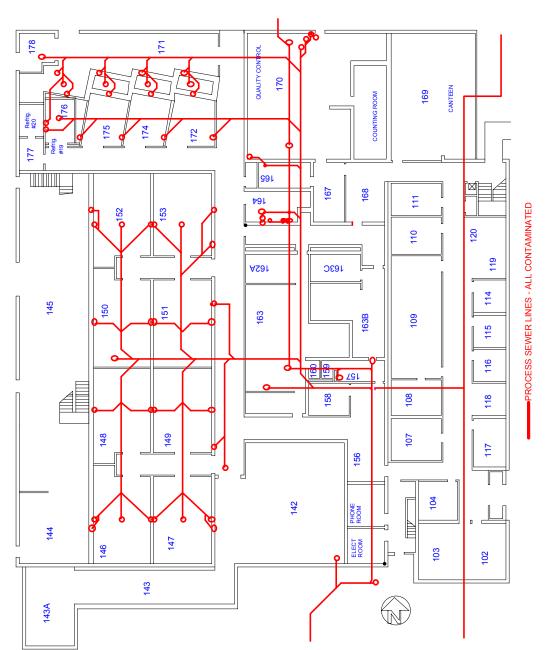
Building 124 South End Process Drain Area (In Color)
